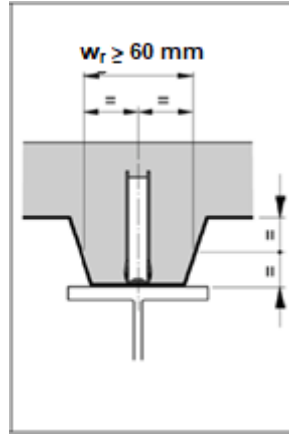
Spacing of connectors for slabs with parallel decking (single rows).
